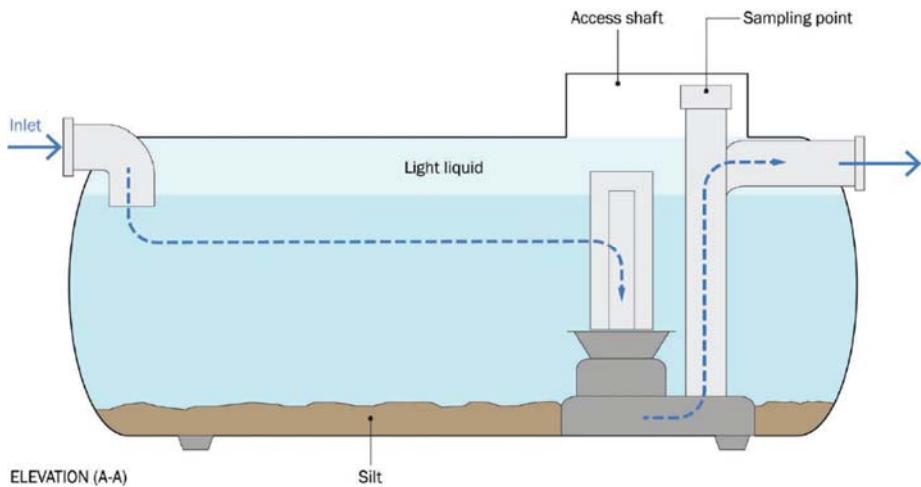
Typical Section Detail of Fuel Separator (CIRIA C753)
